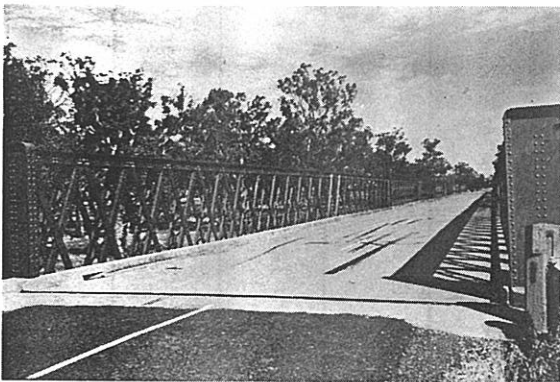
Lattice girder bridges. Deck, pony and Through bridges.
